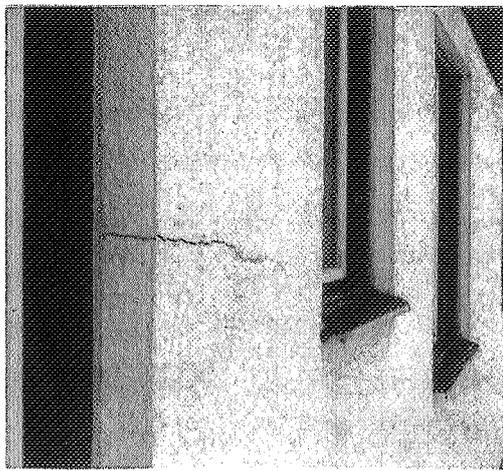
Investigation of the thermal insulation capacity of external wall of light-weight concrete, where a suspected defect – cracking in the construction – has been verified by visual inspection, smoke test and air flow measurement.
